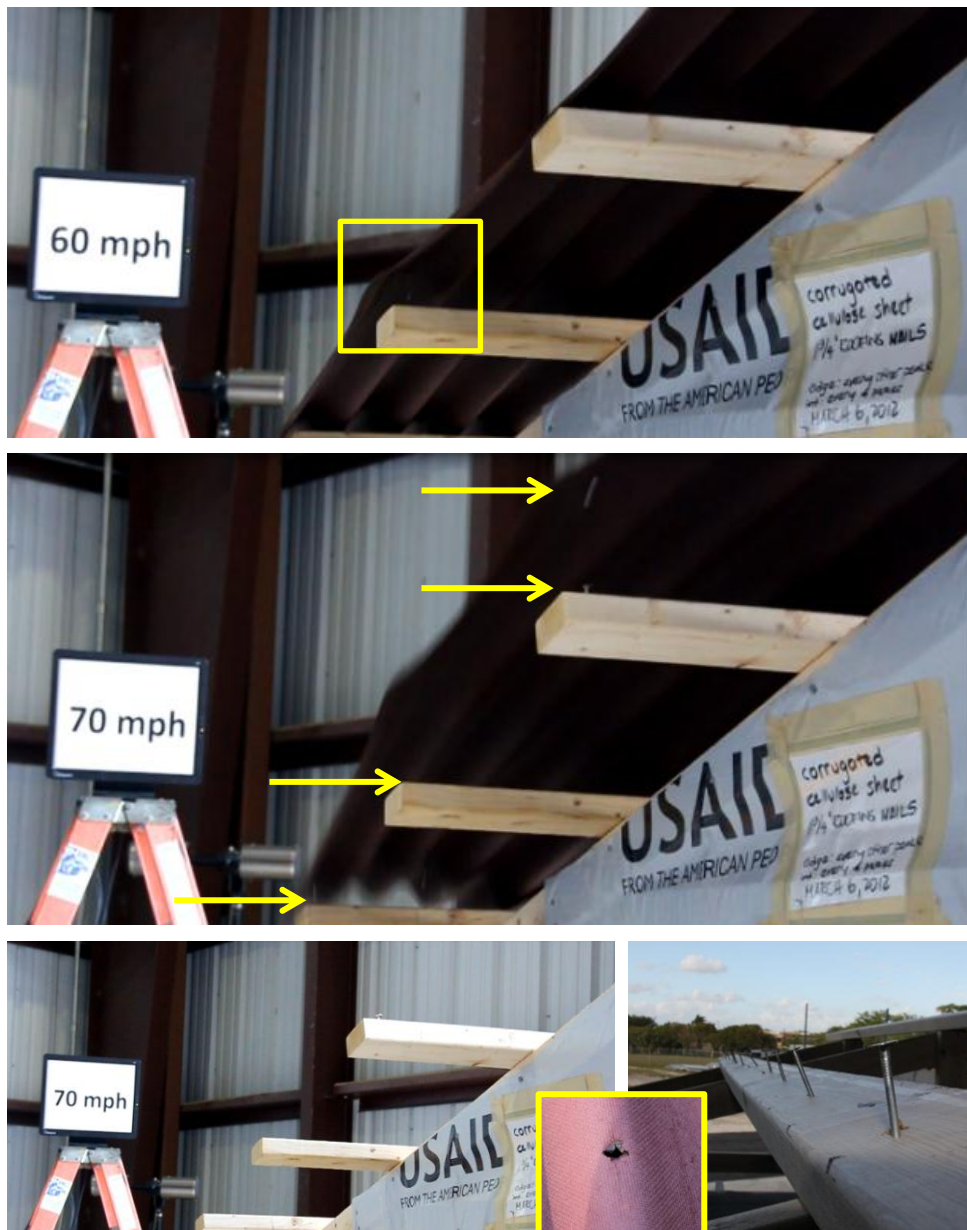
Failure of cellulose-bitumen sheet by fastener puncture of the roofing material
